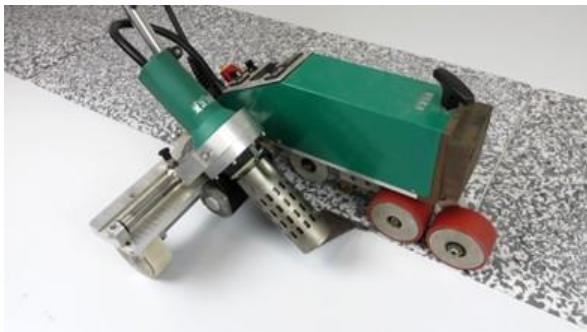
Welding of FATRAFOL WALK 600 walkway tiles
